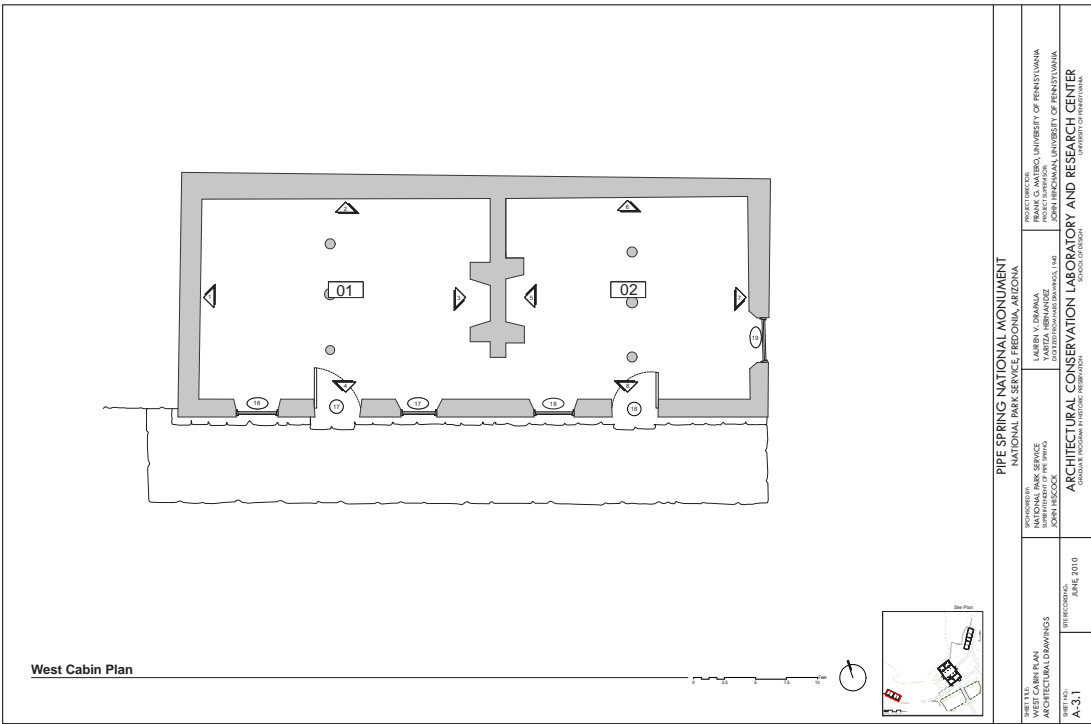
The Architectural Conservation Laboratory, “West cabin plan drawing” (June 2010).
